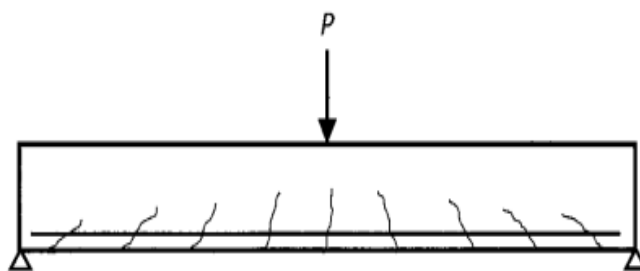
Cracks due to inaccurate rebar positioning [84].
